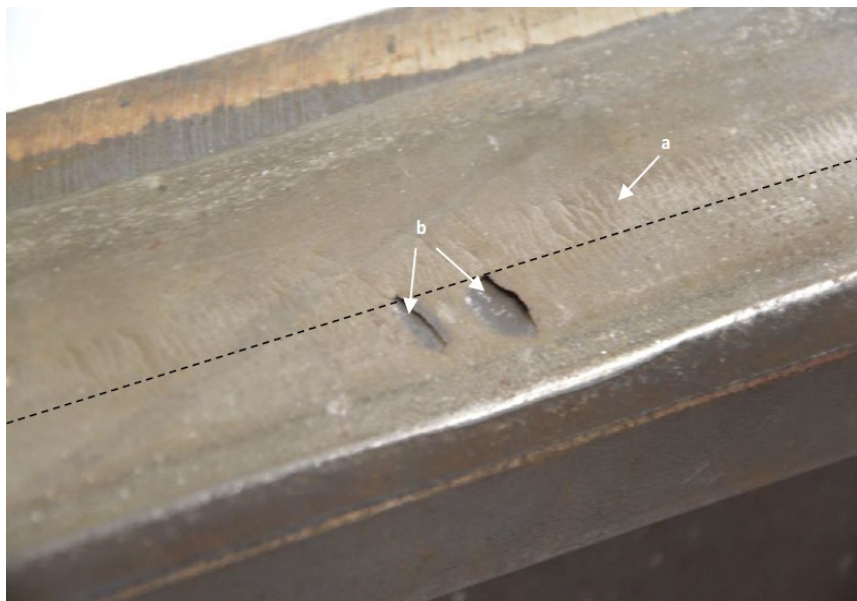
The running surface shows surface fatigue cracks (a) spalling (b) resulting from rolling contact fatigue. The position is located between fracture surface 11.2 and 12.1. The dashed line shows the position of the axial rail cut.
